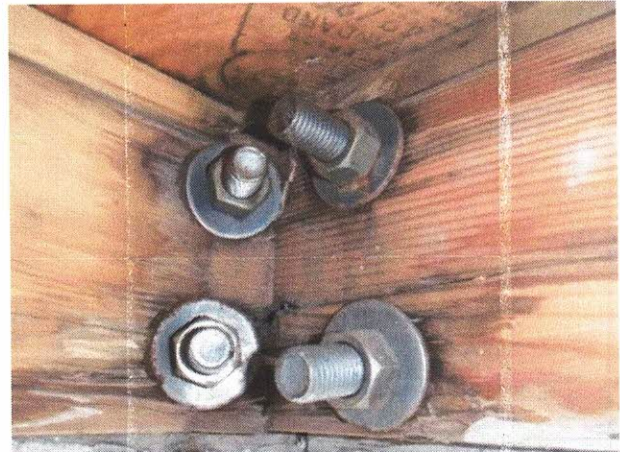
Staining around bolts connecting balcony to column. (Unit 209)
